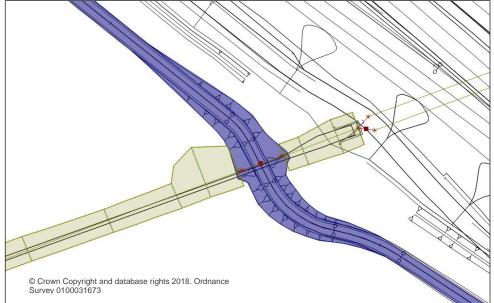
Overview of the proposed new access road and culvert along the Swine Burn.
